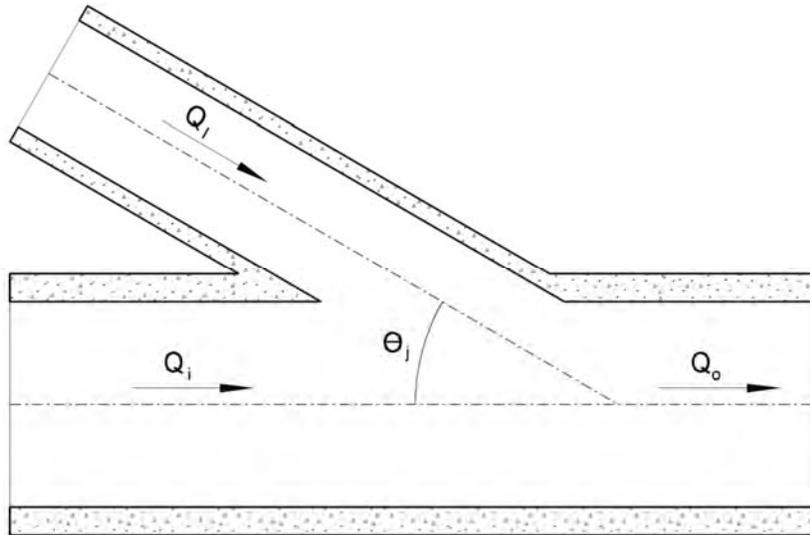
Interior angle for pipe junction without manhole (Source FHWA HEC 22)
